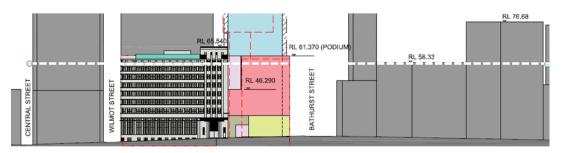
site and predominant building wall height shown dashed along west side of Pitt Street
